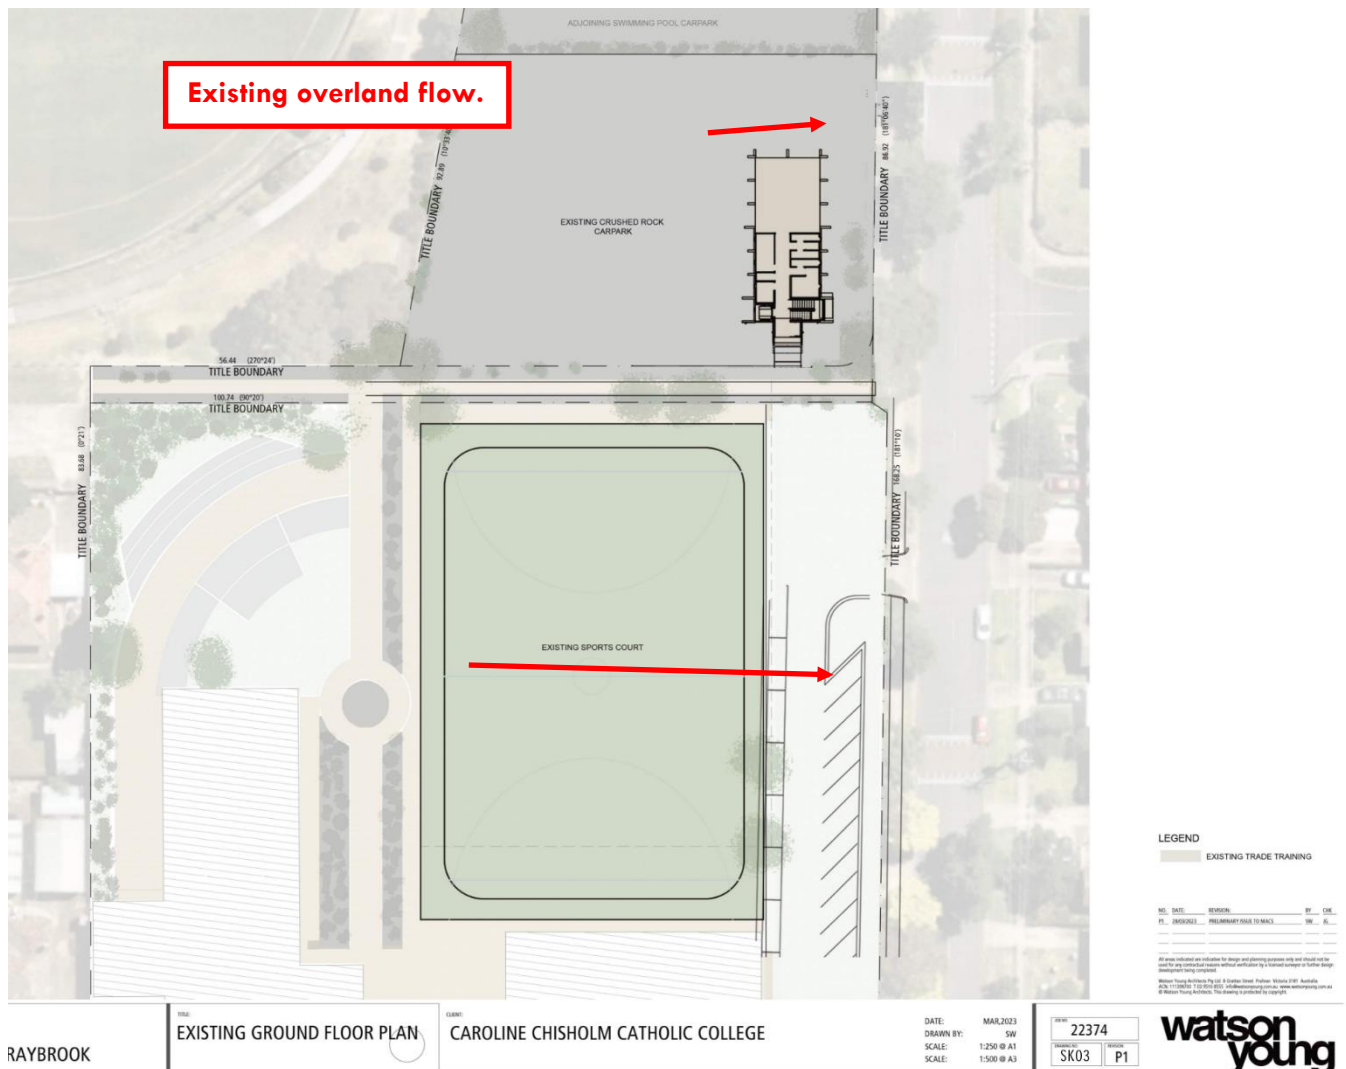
Existing Conditions – Showing existing carpark, and building – Stage 1.1.
